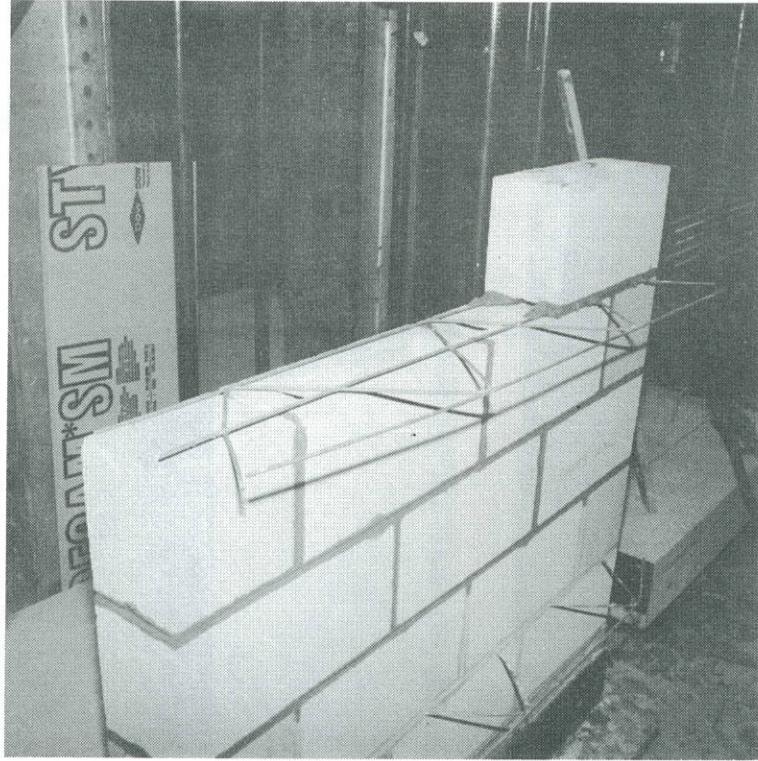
Wire Truss Joint Reinforcement in Block Wall #1
